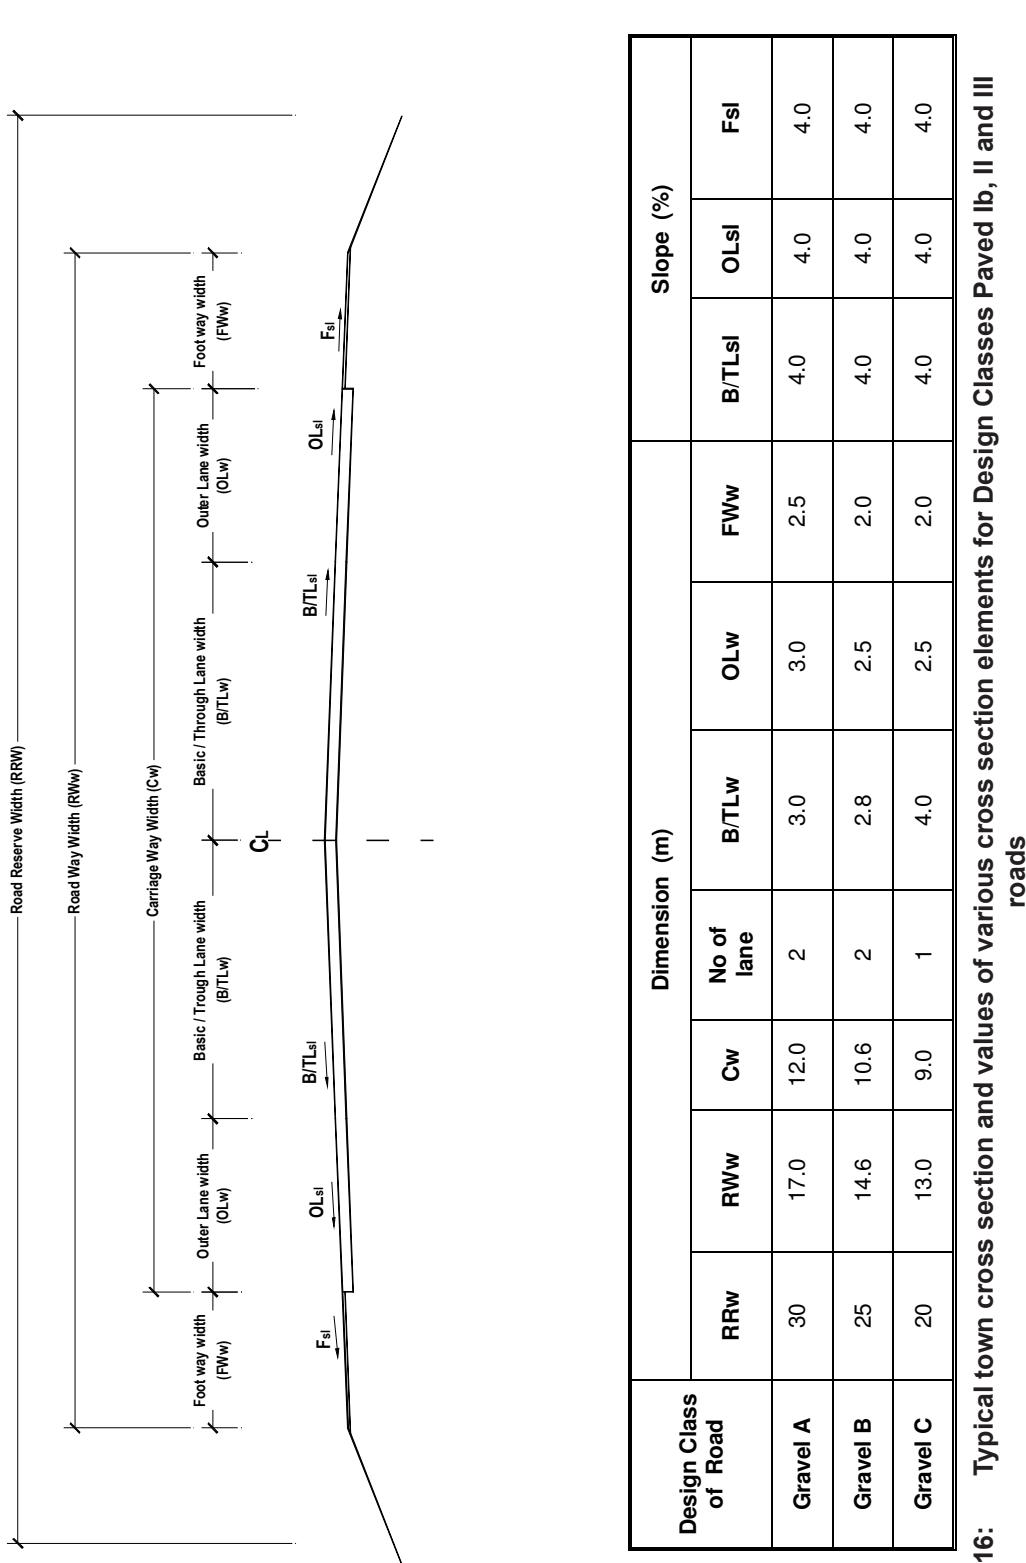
Typical town cross section and values of various cross section elements for Design Classes Paved I<sub>b</sub>, II and III roads
